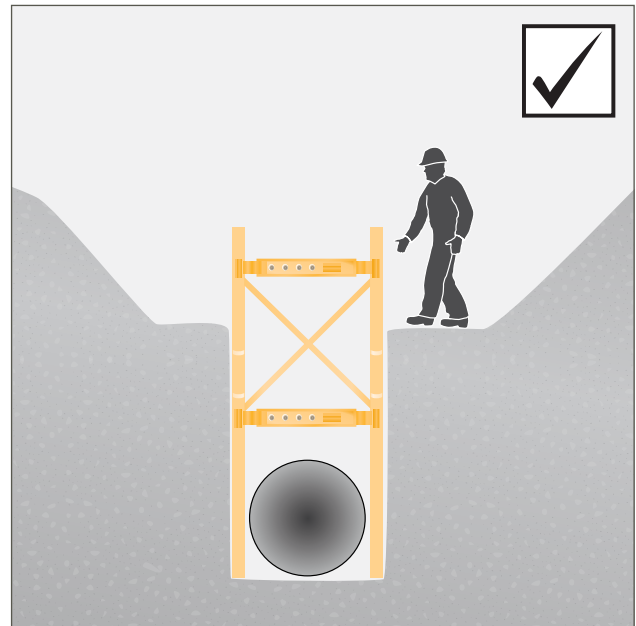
Example of a section of trench shoring extending above the excavation for fall protection.
